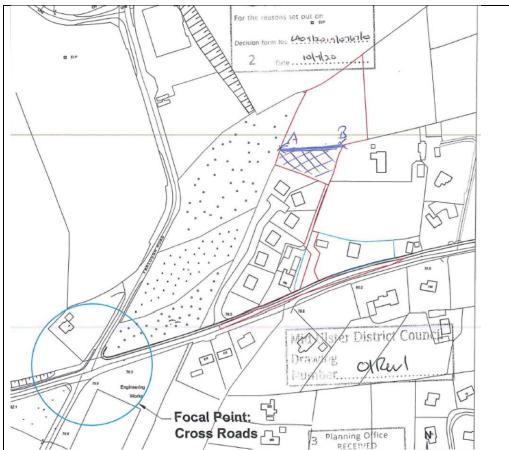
Screenshot of the stamped approved site location plan from LA09/2019/0767/O
